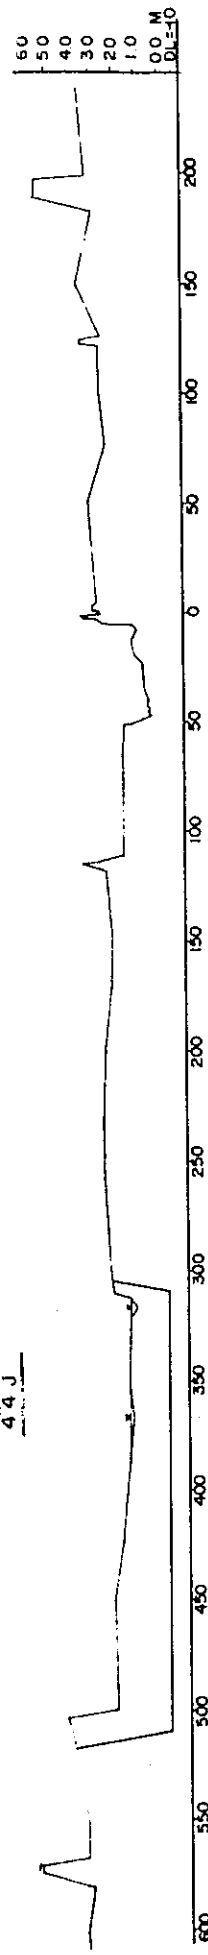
(2) PROPOSED CROSS-SECTIONS FOR URGENT PLAN
